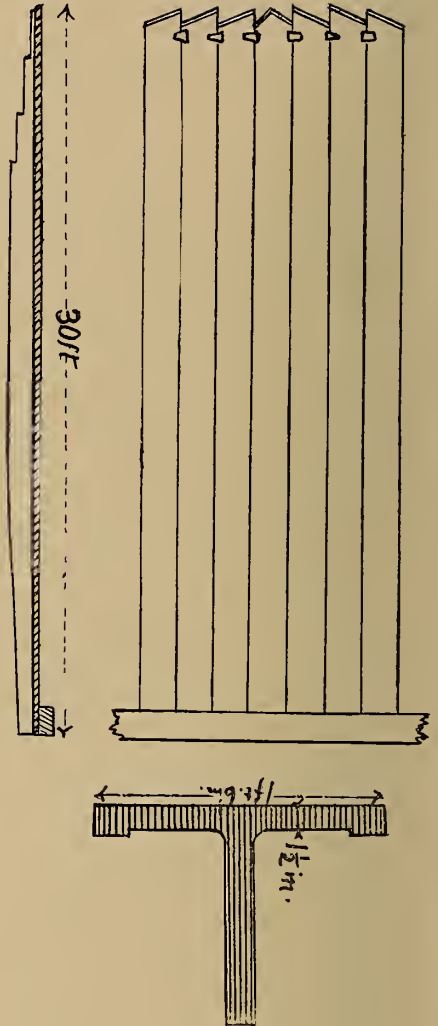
CAST IRON PILING AT LOWESTOFT
